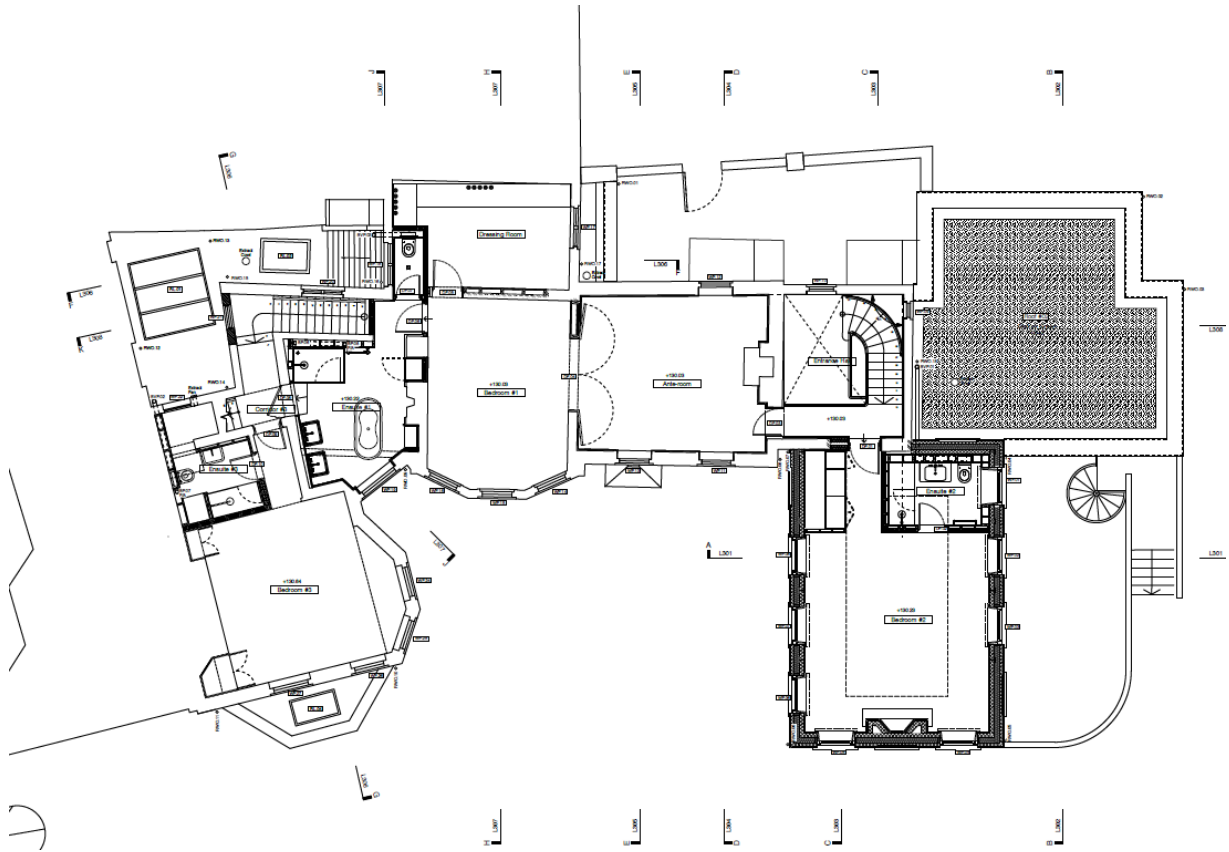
Proposed First Floor Layout at Grove Lodge
